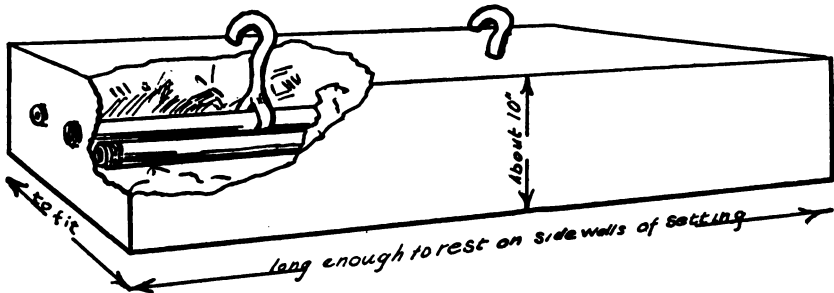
CONCRETE BACK ARCH, FOR HORIZONTAL TUBULAR BOILER. CORNER BROKEN AWAY TO SHOW PIPE REINFORCEMENT.
